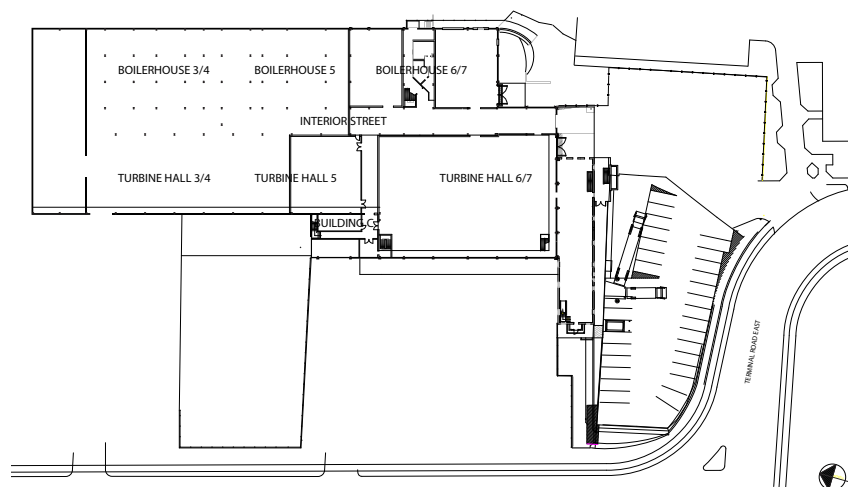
As-built plan, prior to renovation, showing the boiler houses and turbine halls.
